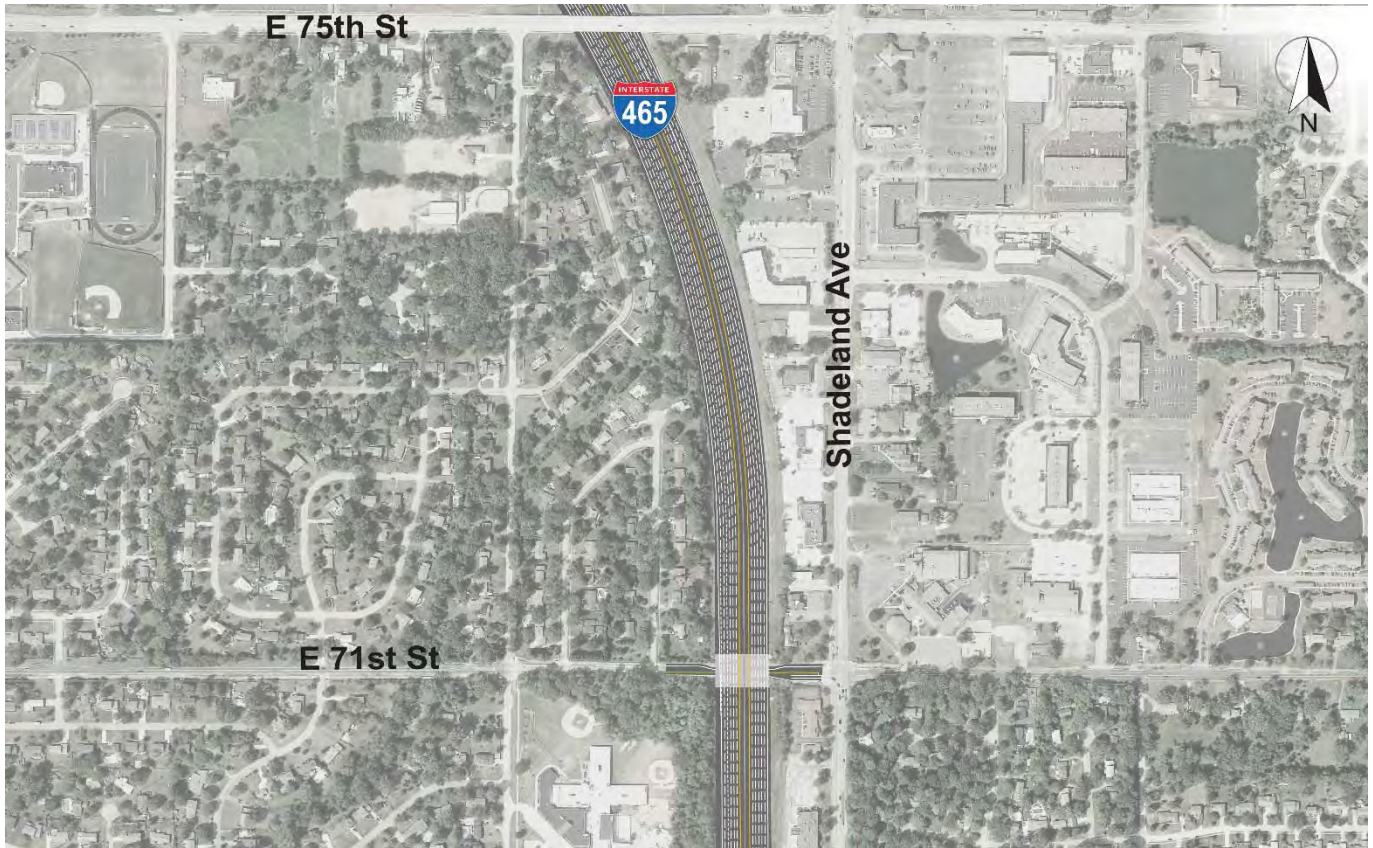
Recommended Alternative at I-465 and 71st Street and 75th Street
